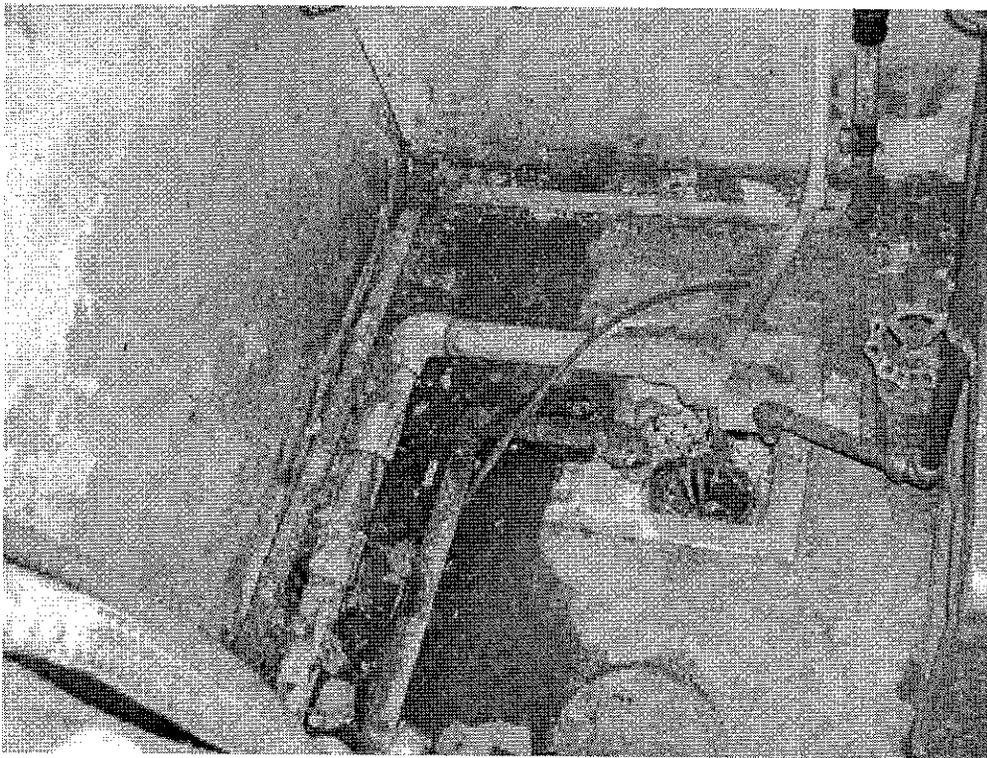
View of floor sink/drain area. Note crack in concrete on lower right side of photo, emanating from corner of sink. Boiler water collects along left wall because there are no breaches in concrete at that location (crack area is normally dry).
